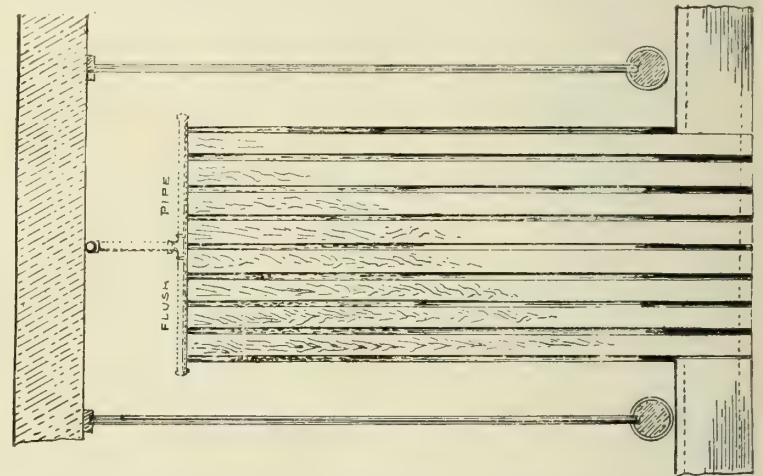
SHOWING FLOOR PLAN AND SOCKET, ECONOMY SANITARY STALL
